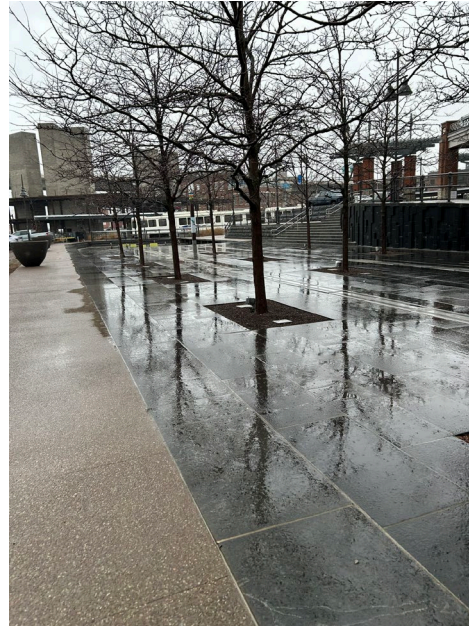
View of cover system within Parcel D2 – facing west (photo date: March 11, 2026)
